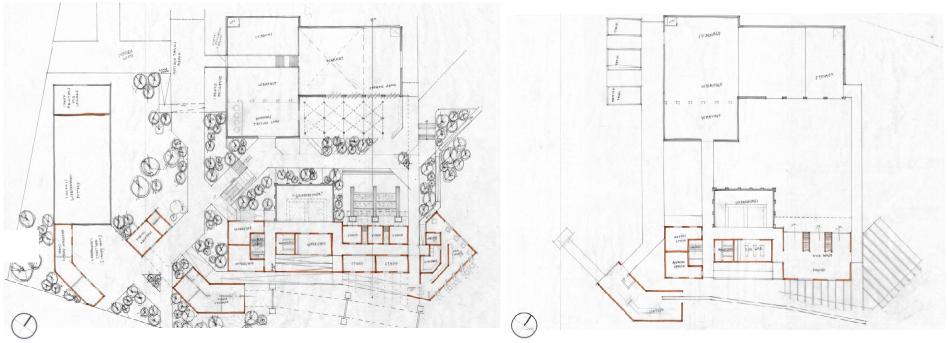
Iteration 6 Ground Floor Plan - August (Author 2017)
